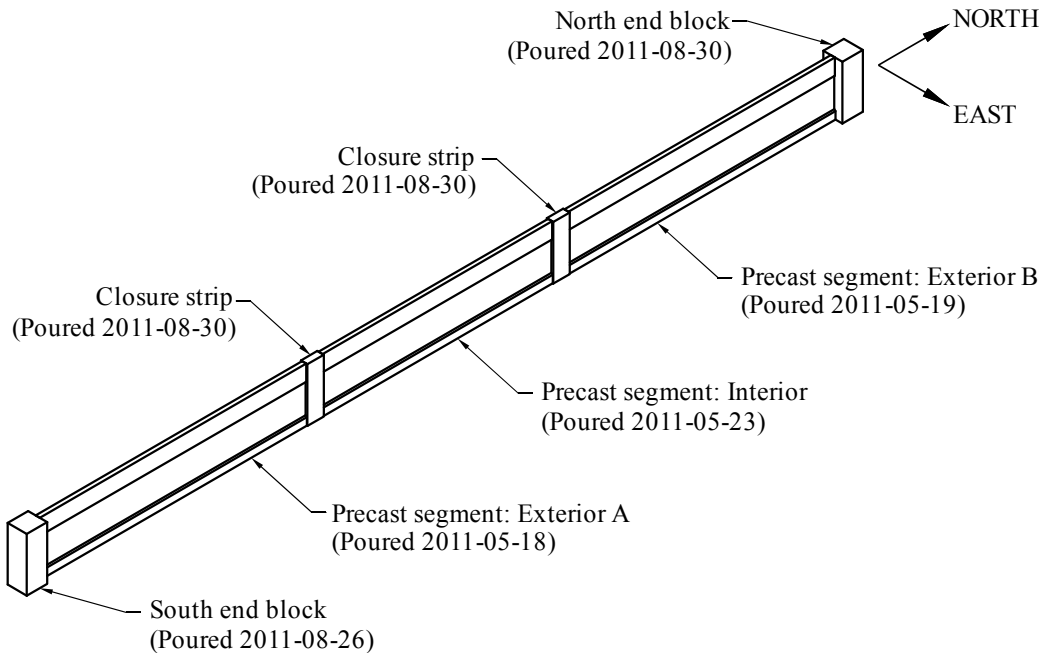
Casting dates for girder components and final orientation of girder in FDOT laboratory
